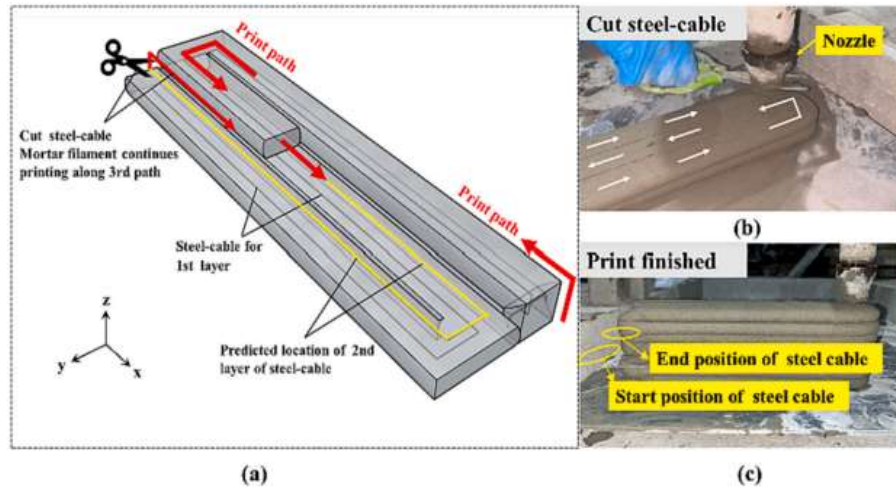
Print Path Schematic for four-point bending test specimen (a) Printing path; (b) Cut steel cable; (c) Finish printing [12]
